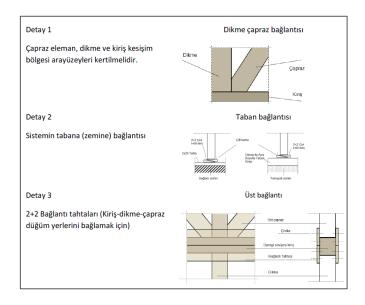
Connection details for timber-frame scaffolding system of superstructure (Source: General Directorate of Foundations' Guideline, 2017)
